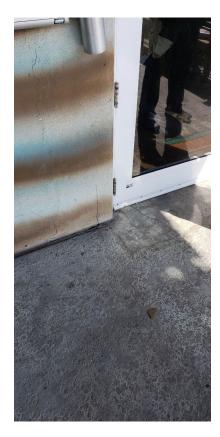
Front Entrance. Location 12: 8x8 cell of the end CMU block to be fully grouted from header to ground.
